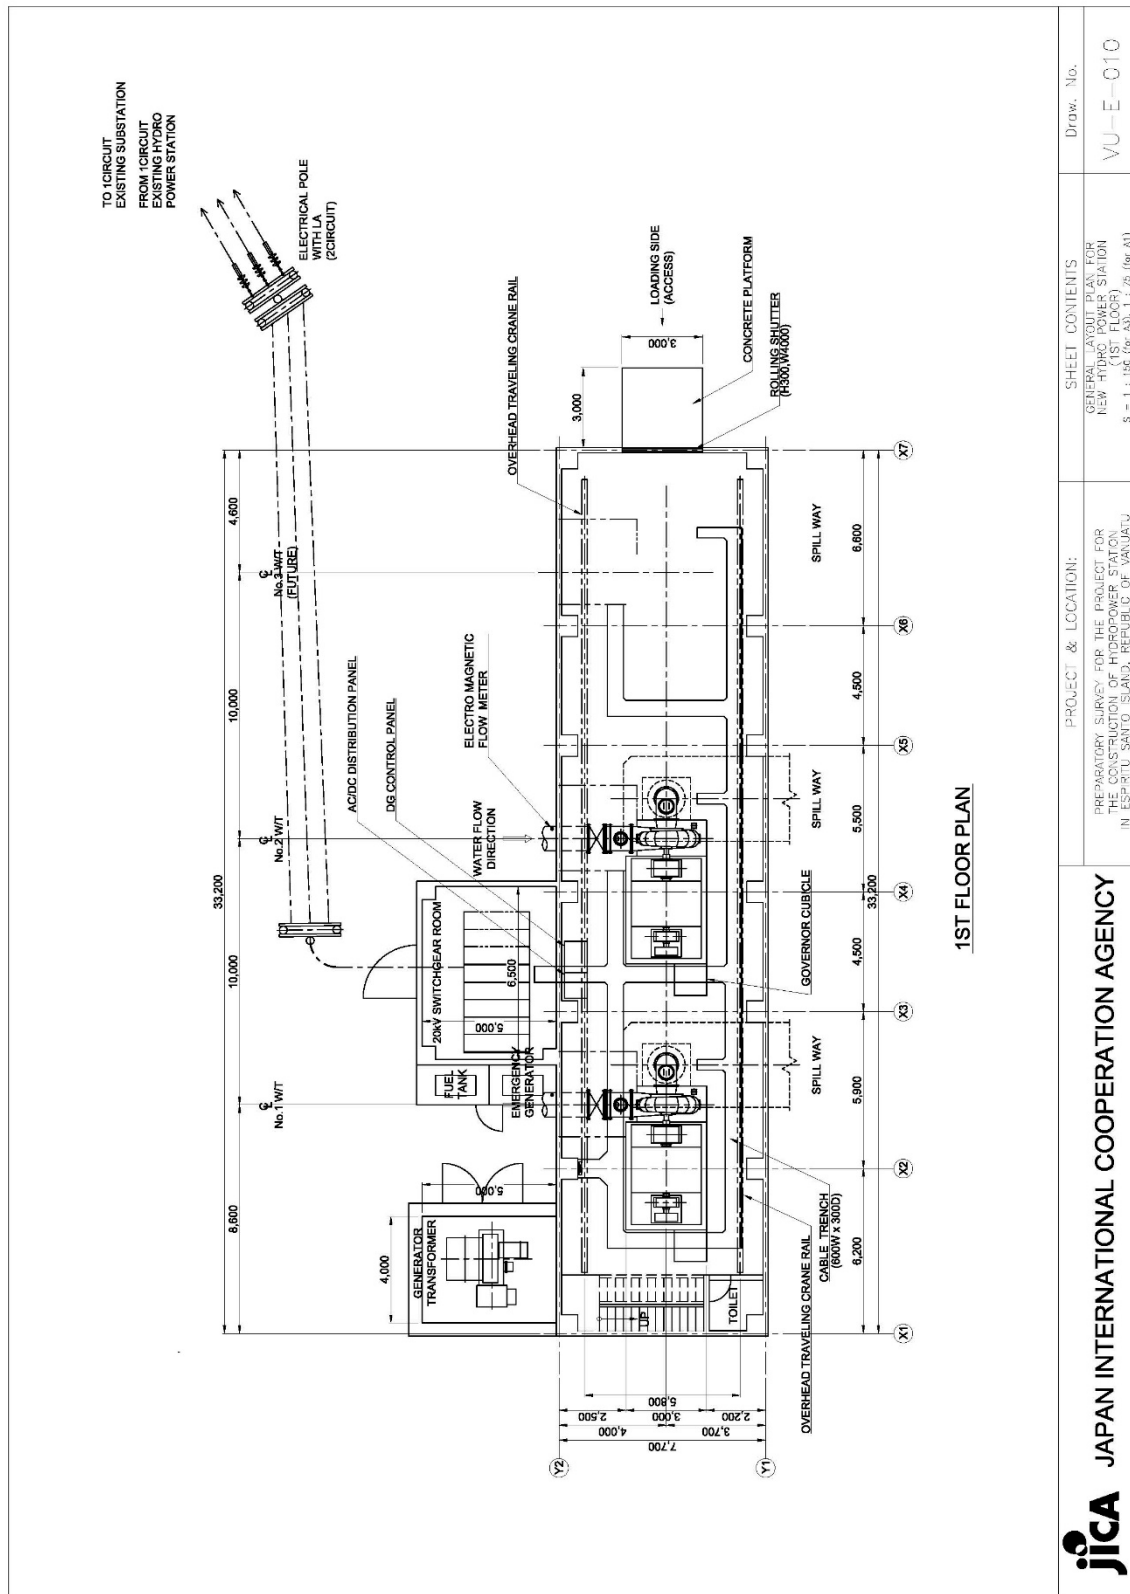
Layout of the New Powerhouse (1st floor)
